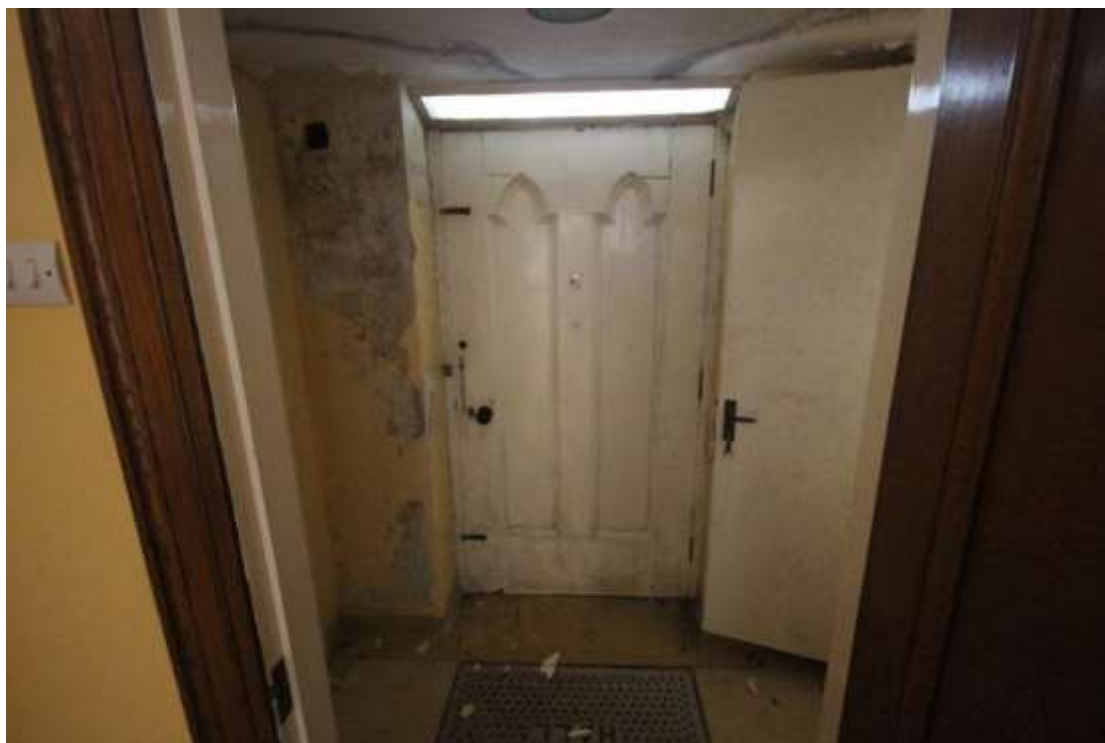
View into the Porch area, accessed from the Reception Hall in Block B, facing west.
